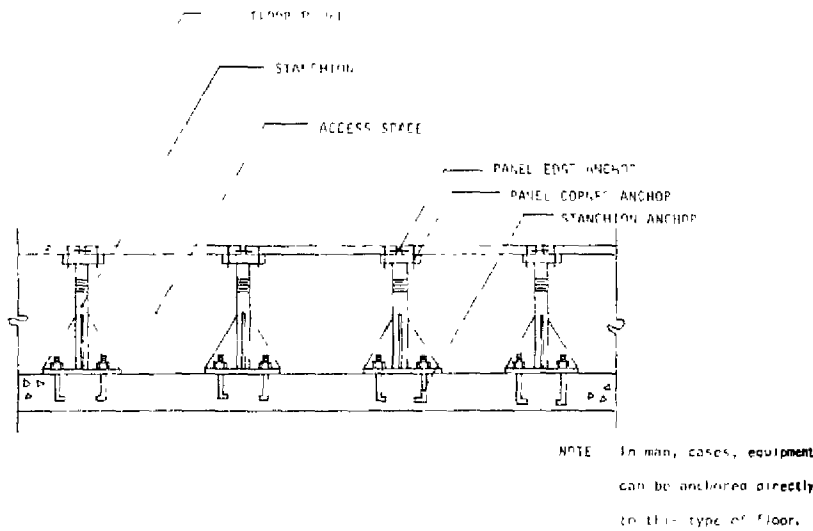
Access floor systems. Interlocking access floors showing floor panels, anchors, and stanchions.
